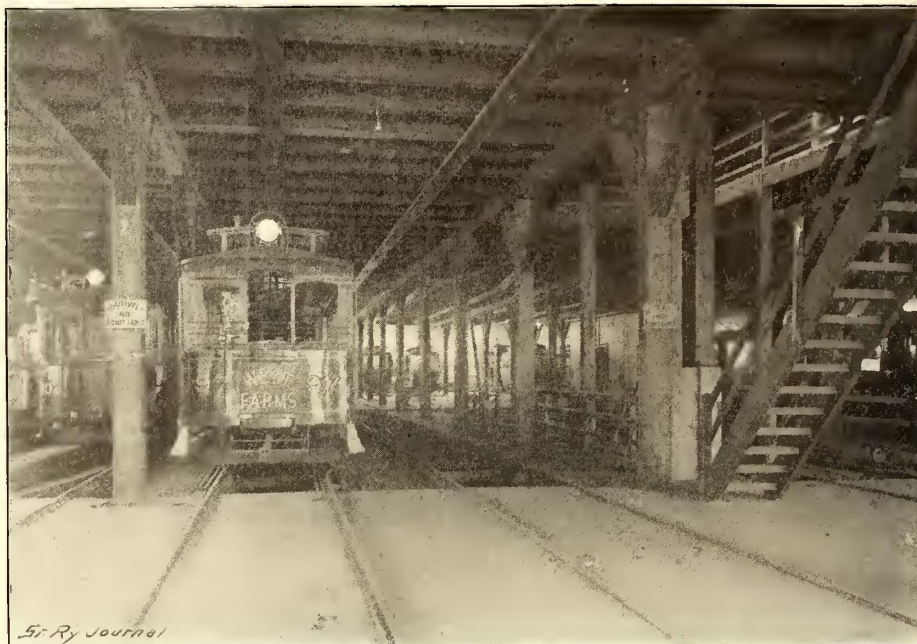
VIEW OF GROUND FLOOR OF CAR HOUSE—UNION RAILWAY COMPANY, NEW YORK CITY.
